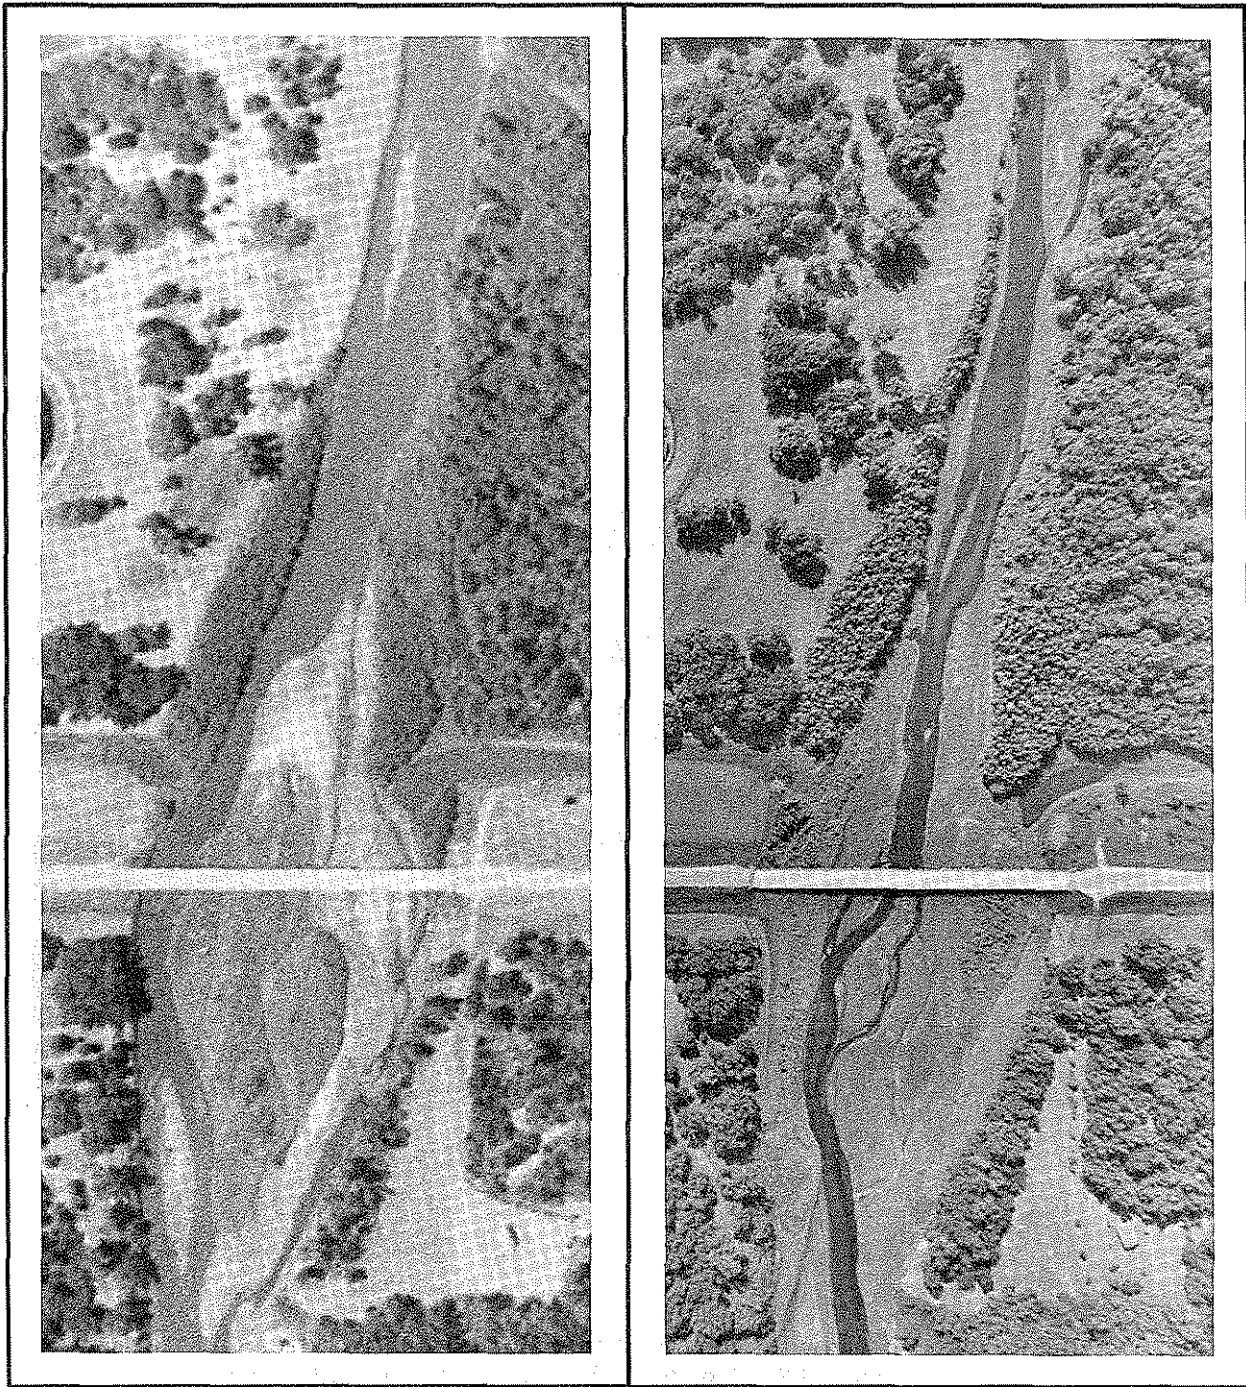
Aerial photos of West Fork Cedar River bridge crossing (left) prior to vane installation in 1984, and (right) in 1989, five years after vane installation.
